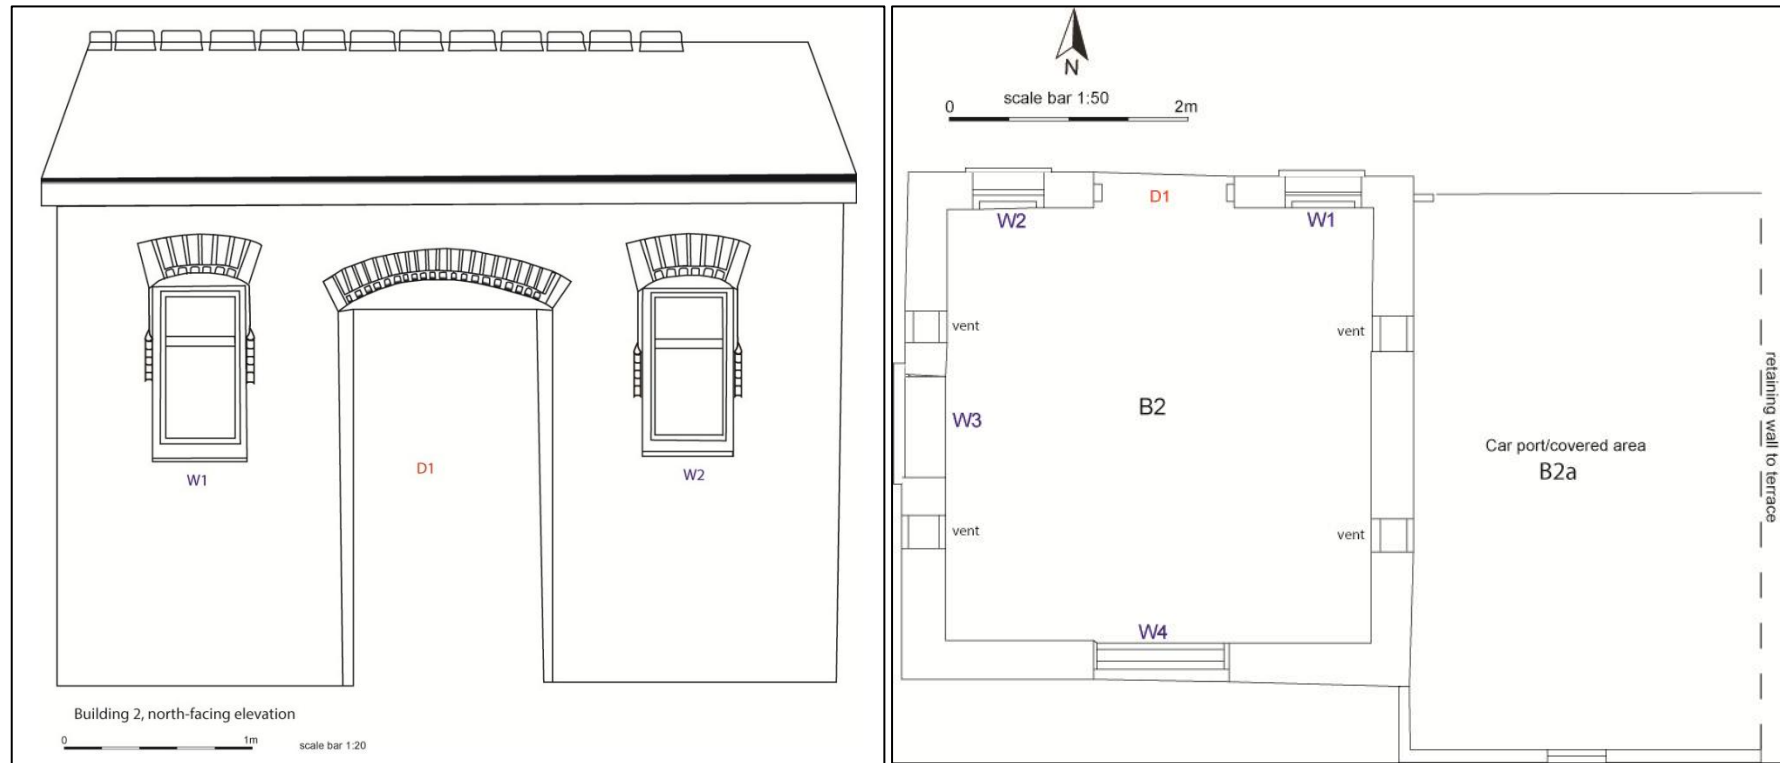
DRAWN ELEVATION AND PLAN FOR B2, LIKELY THE MORTUARY BUILDING.
